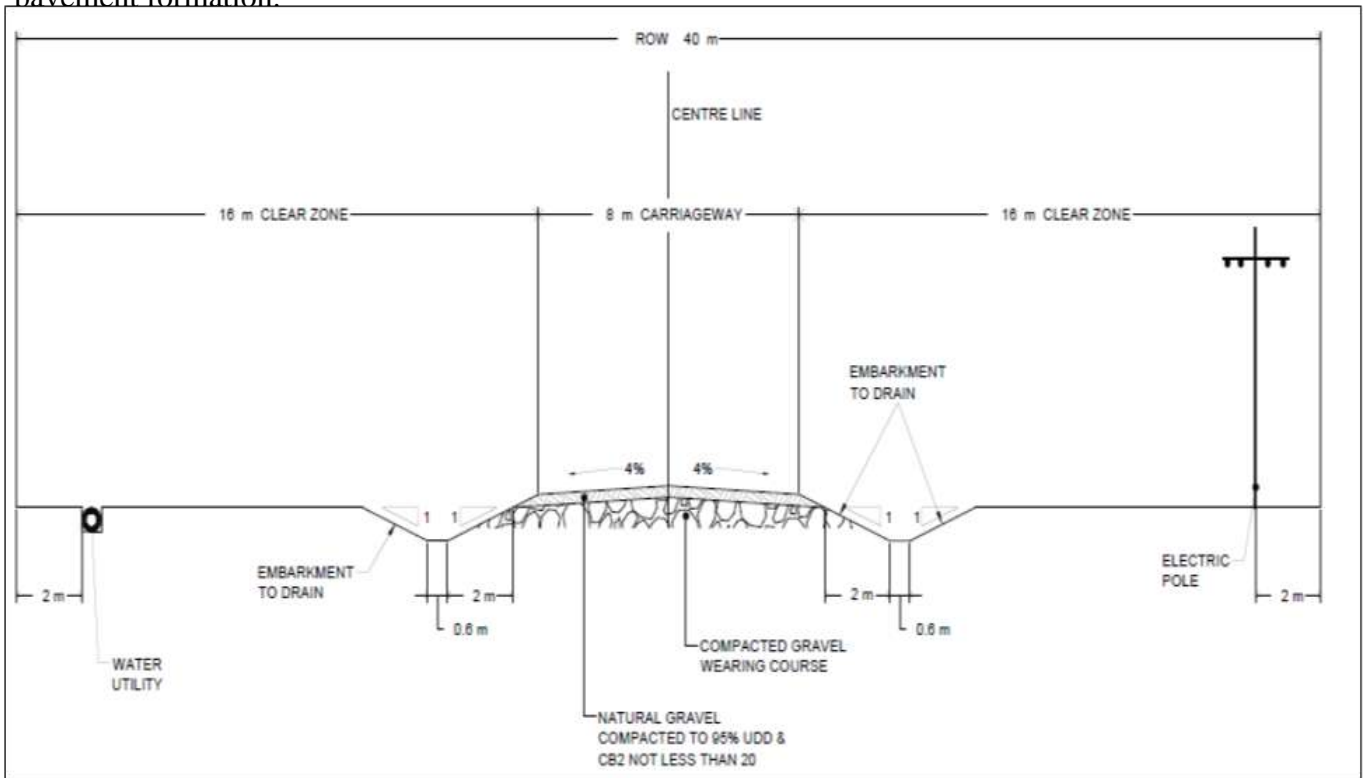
Typical Section of a murrum surface road as proposed for the MSEZ-RSIP
